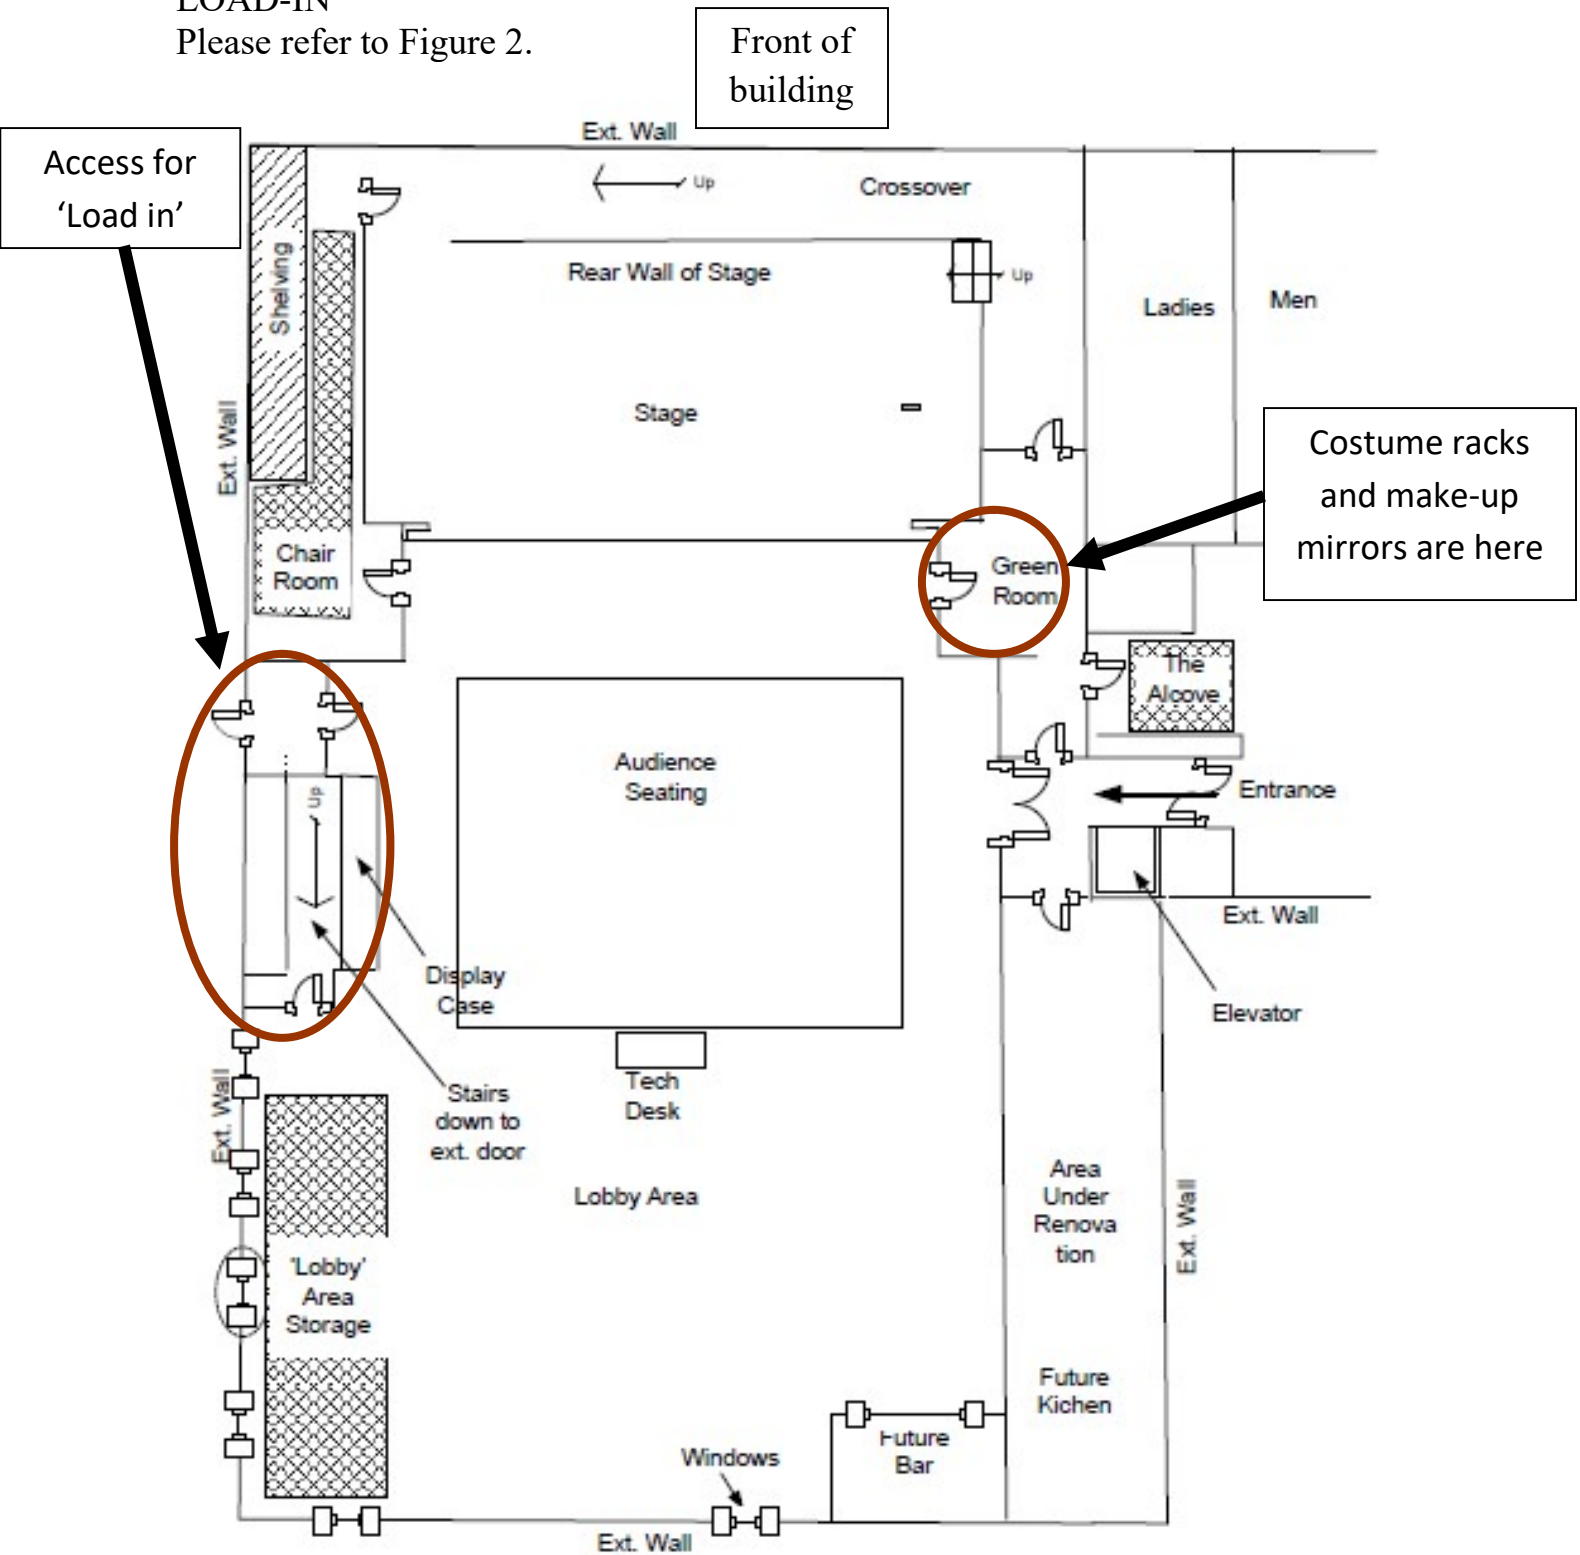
Plan view of Main Hall with 'Load in' access door and stairs (circled).
